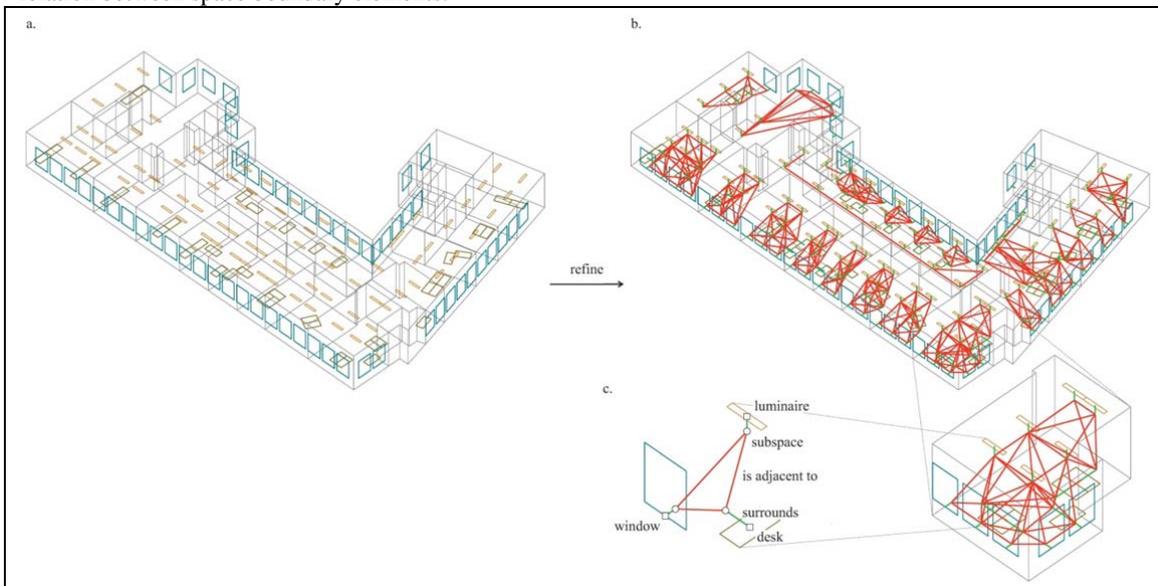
Derivation of a layout element network and subspaces. a. Whole spaces and space elements created in a BIM system for architectural design. b. Converted layout with automatically derived layout element network and subspaces.
